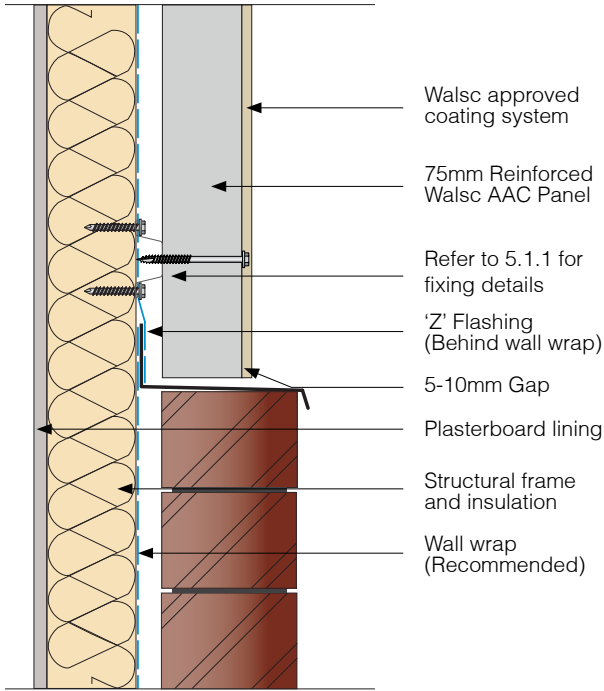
Conjunction detail between AAC Panel and Brick Veneer 1
